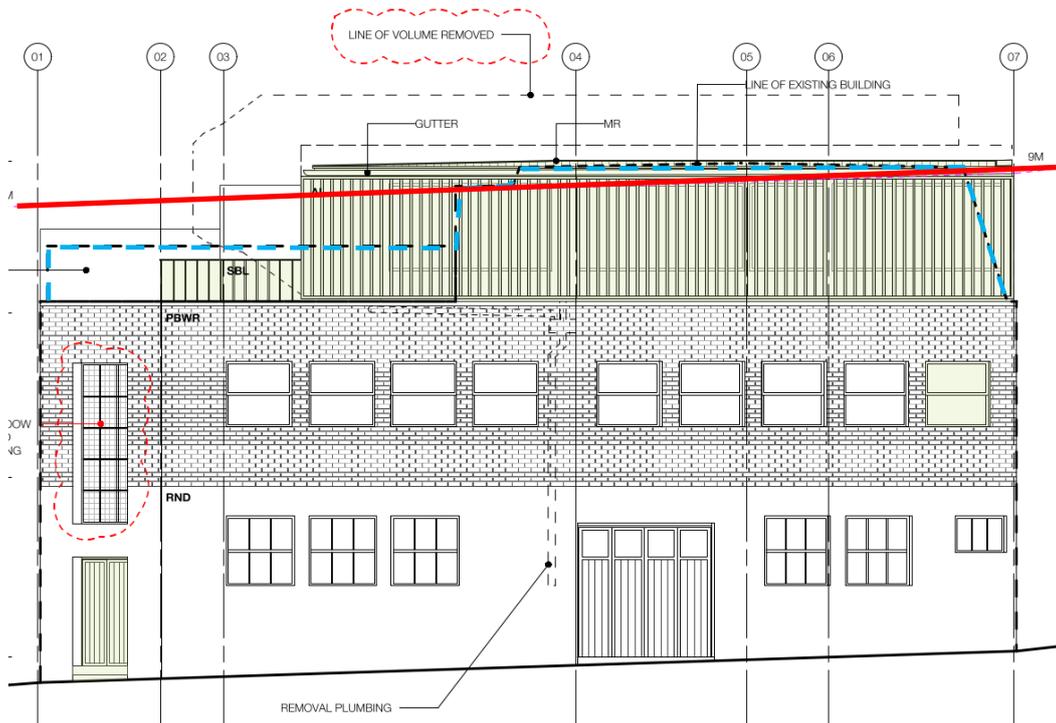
Proposed west elevation with 9m height control shown in red and the height of the existing building shown dashed in blue.
